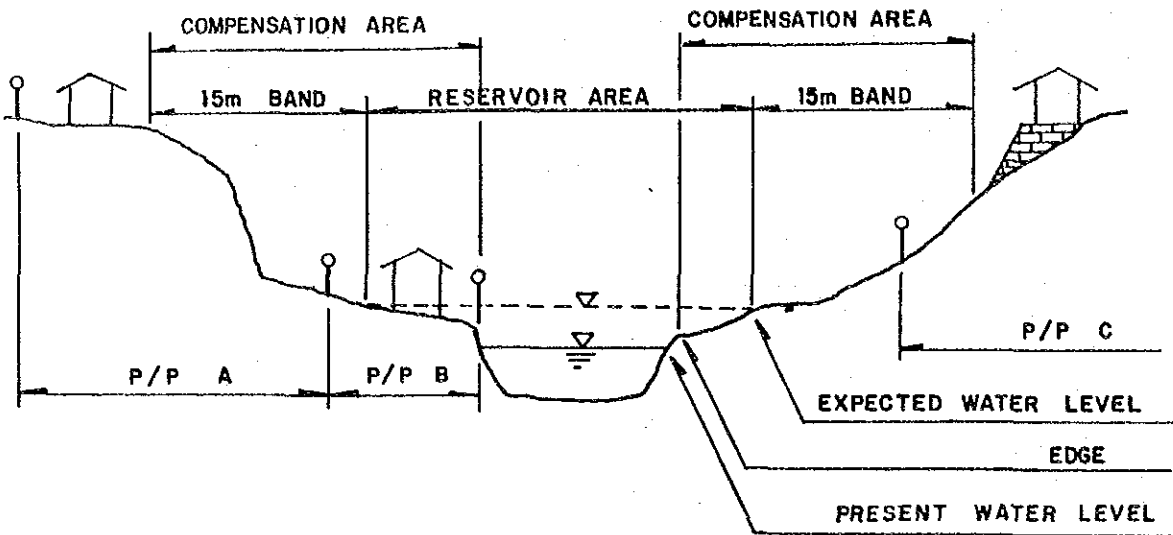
ZONING PLAN OF SALTO PILÃO
